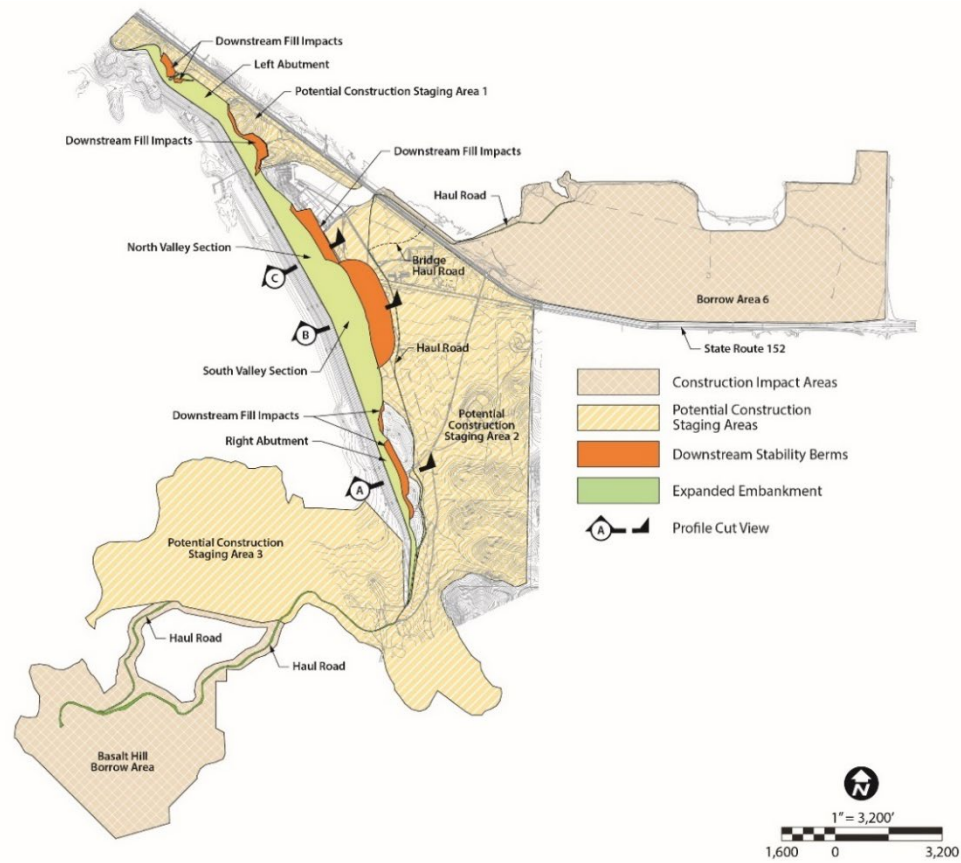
Dam Raise Facilities, Construction, and Staging Areas
